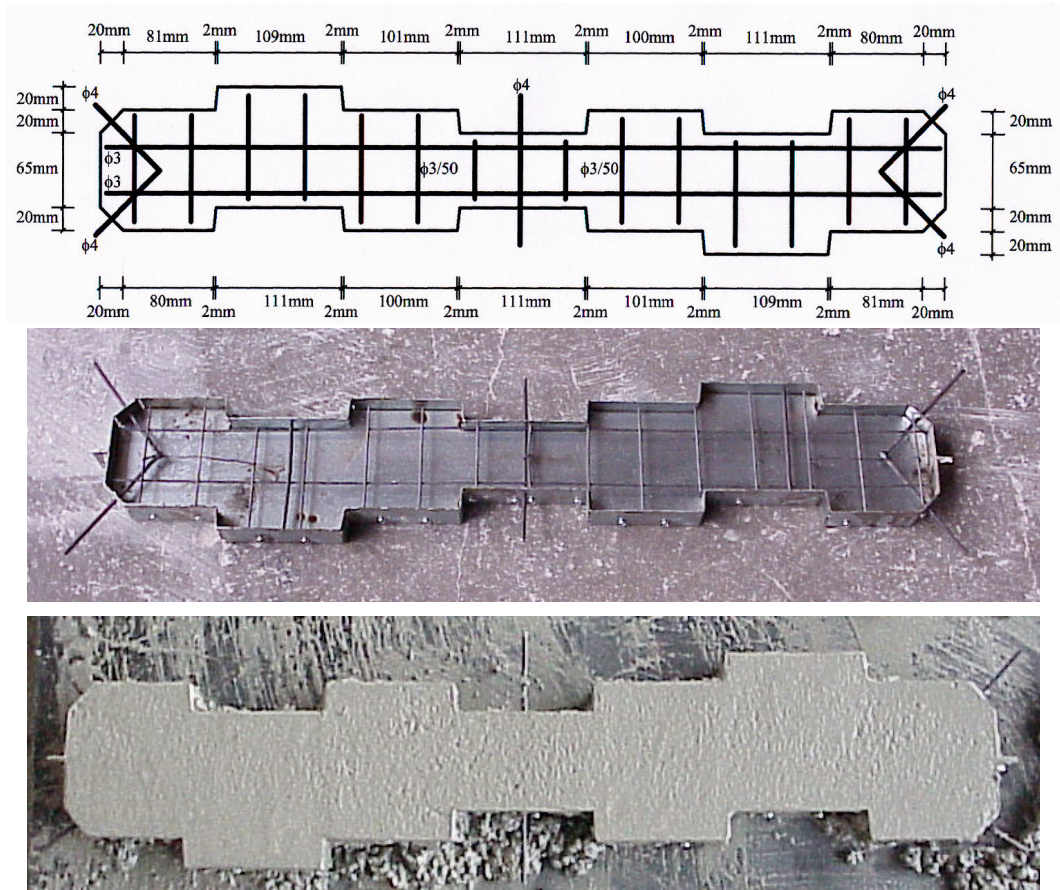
Dimension, reinforcement and moulding of Type B panels
